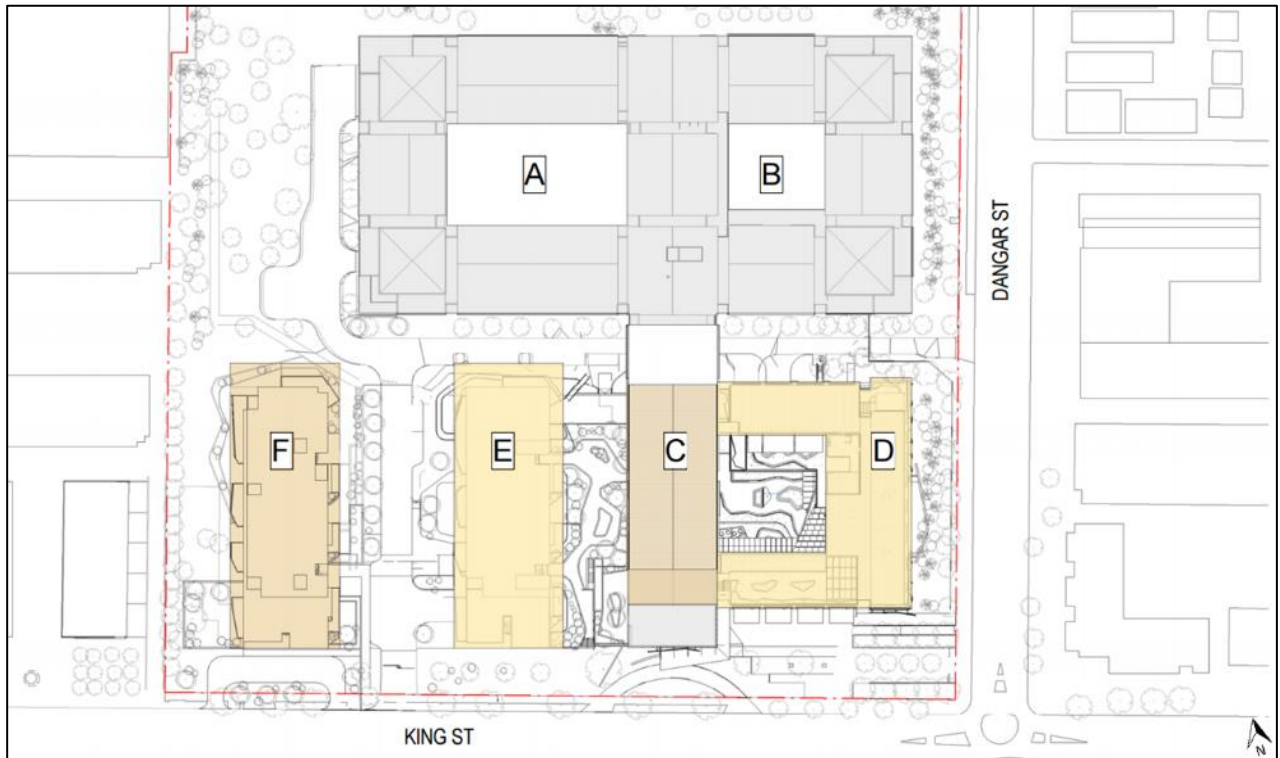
Concept Approval building envelope locations, layouts and heights (Source: MP09_0188)
